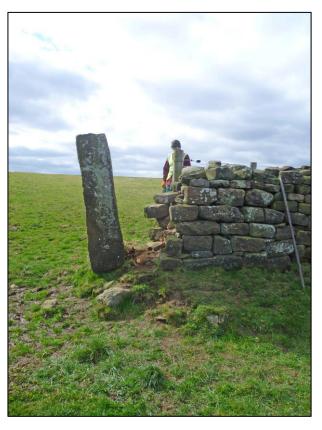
Western wall end after dismantling, looking S (photo 1/302).
